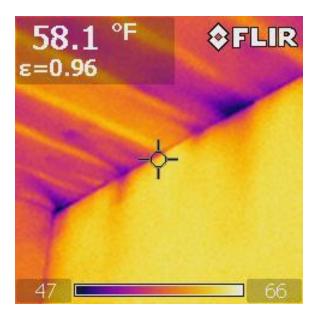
Infiltration Detection—Wall and Ceiling Seam
